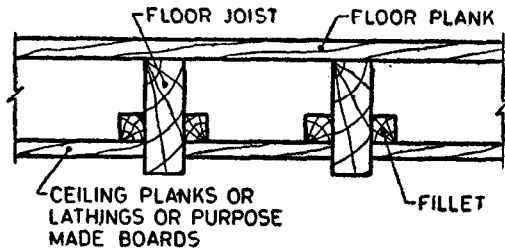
OPEN CEILING BELOW FLOOR JOISTS
